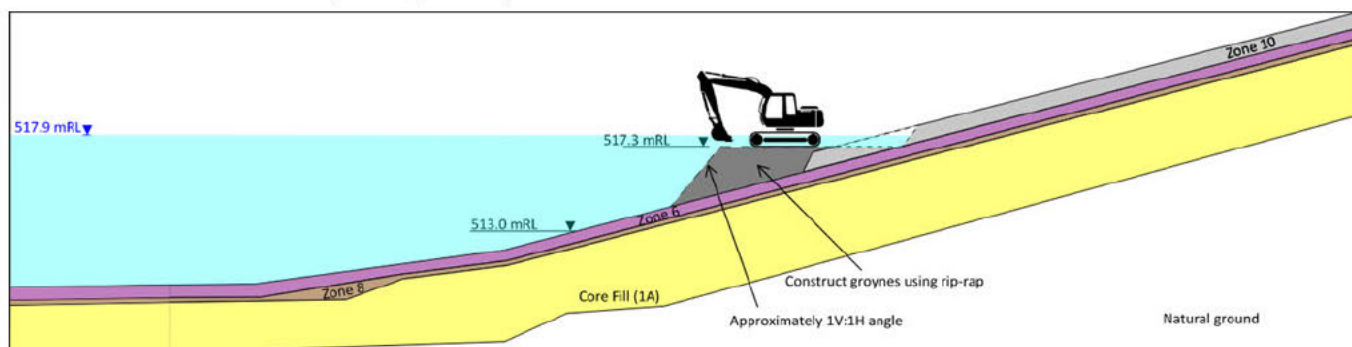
Schematic sketch – Tranche 1 – abutments – construction of groynes perpendicular to the abutment face – Not to Scale
